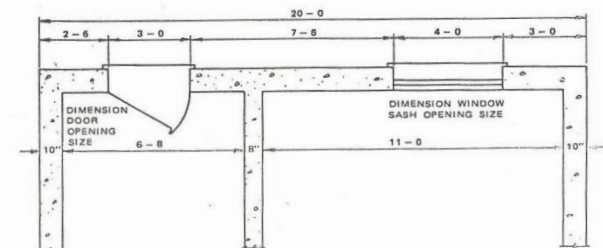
Solid masonry walls (cast concrete, block, brick, or stone) are usually dimensioned as shown.
